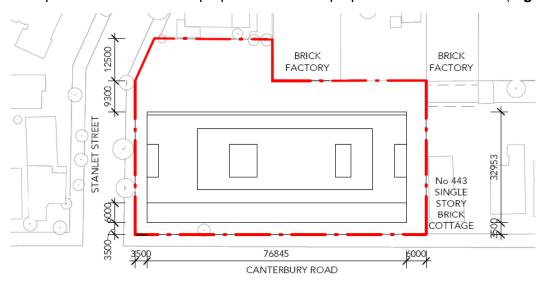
Site plan showing proposed setbacks (Source: Extract from Planning Proposal, p.17)
